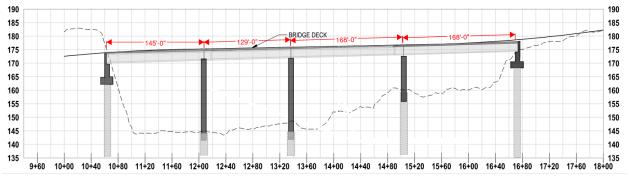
Option 5 - Four-Span Prestressed Concrete Girder Bridge Elevation (Spans: 145, 129, 168, and 168 feet)
